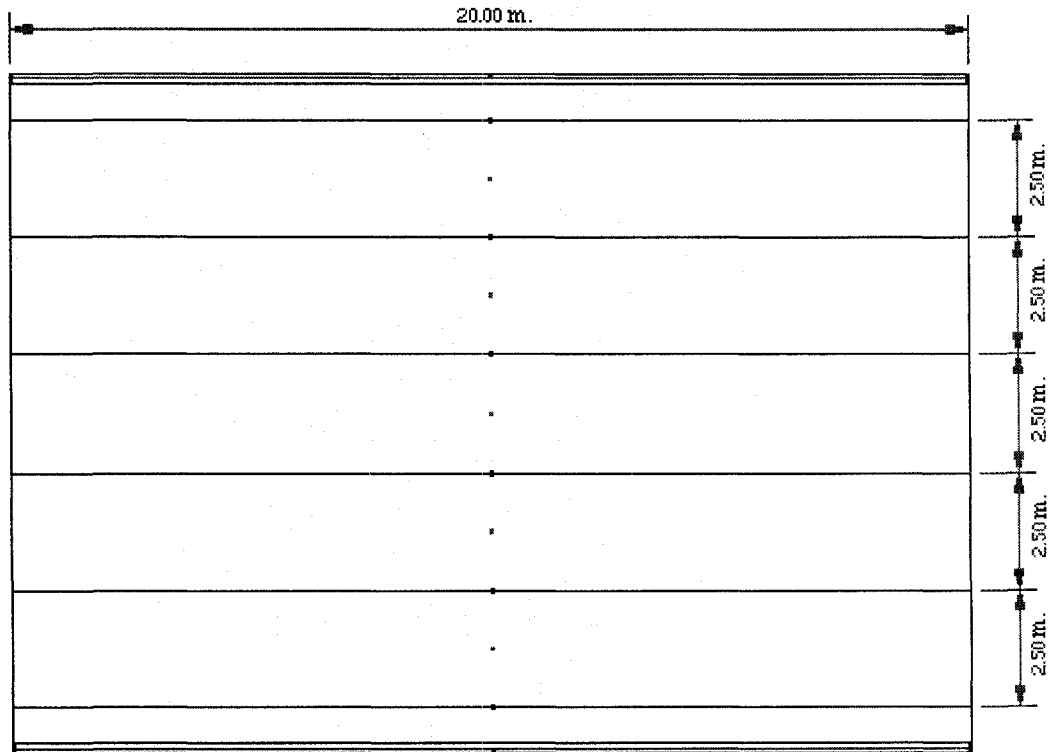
Plan of *PC* Bridge Structural Numerical Examples.
